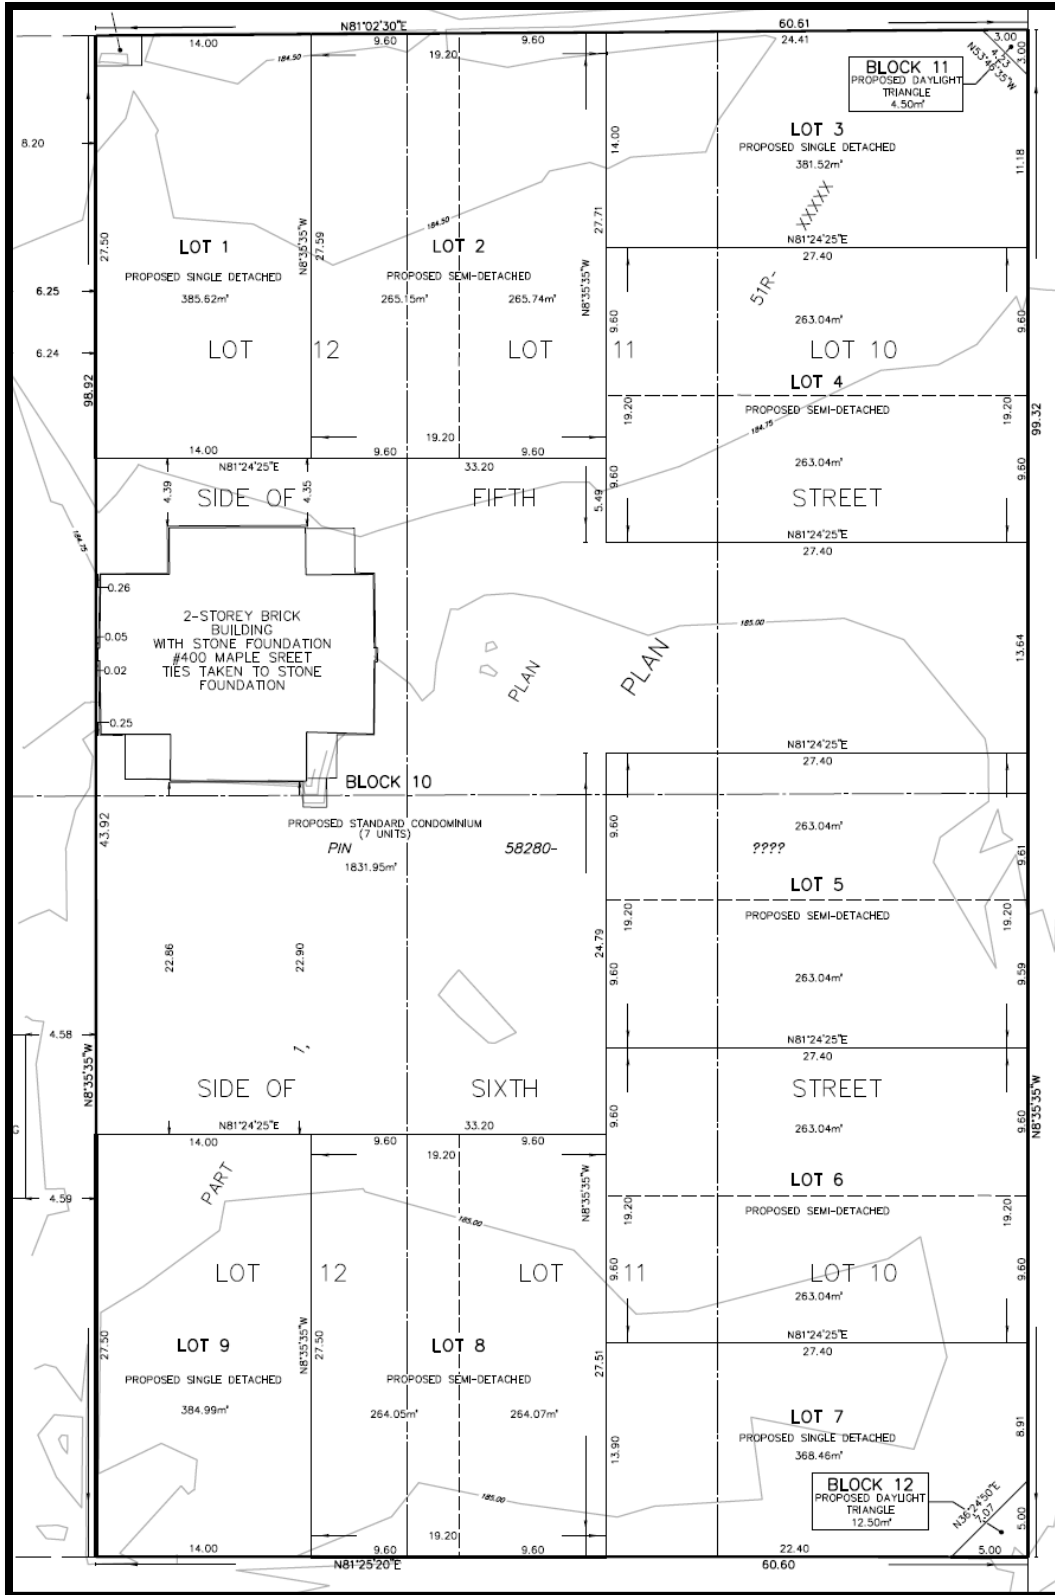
Proposed Draft Plan of Subdivision (Excerpt, J.D. Barns)
